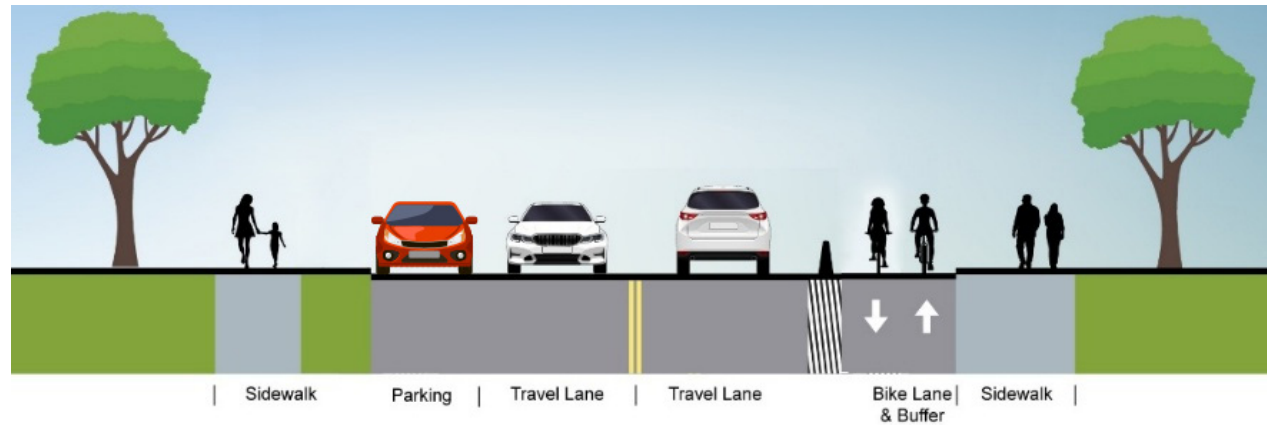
Typical cross-section of a street with a two-way Class IV cycle track
